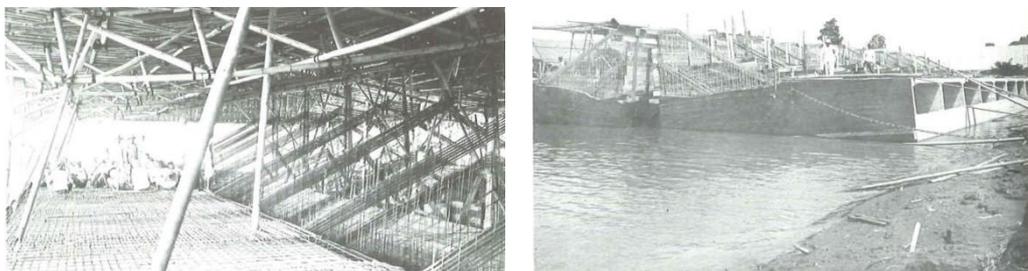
Construction of caissons (horizontally) with the traditional timber formwork method (Tandjong Priok, 1914)
